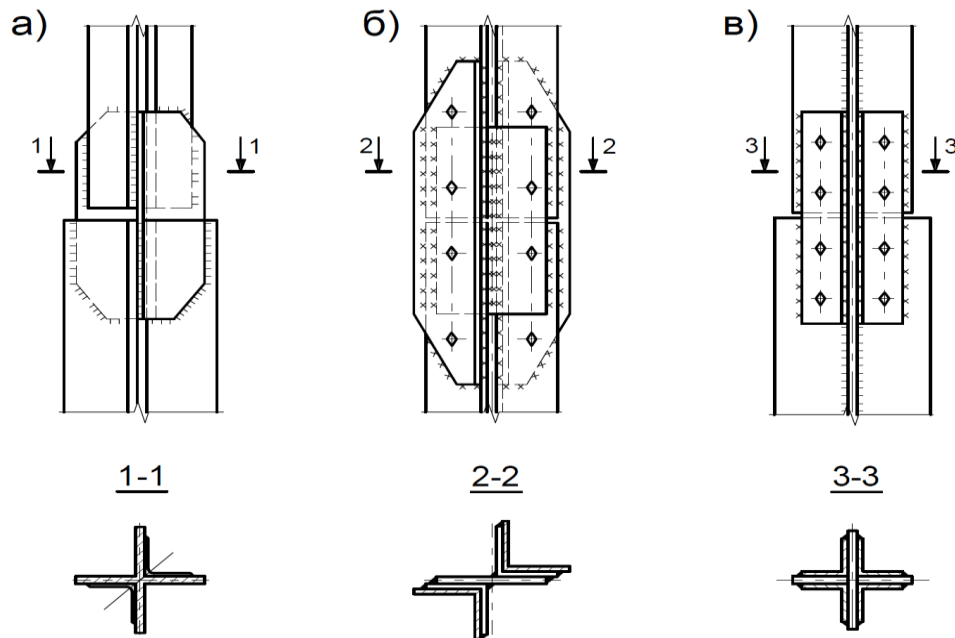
Design solutions for factory and installation applications connections of cross section elements:
